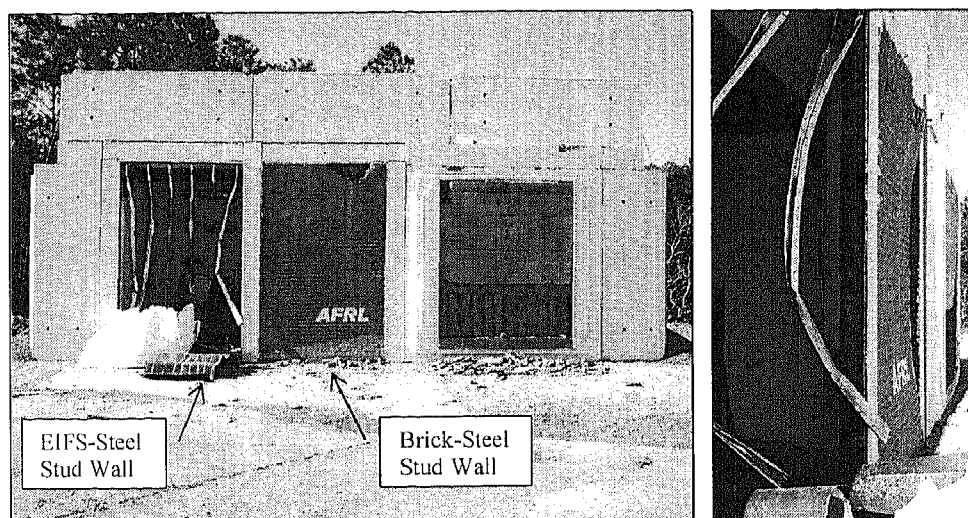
Post-Test Exterior View of EIFS Façade and Brick Façade Walls
